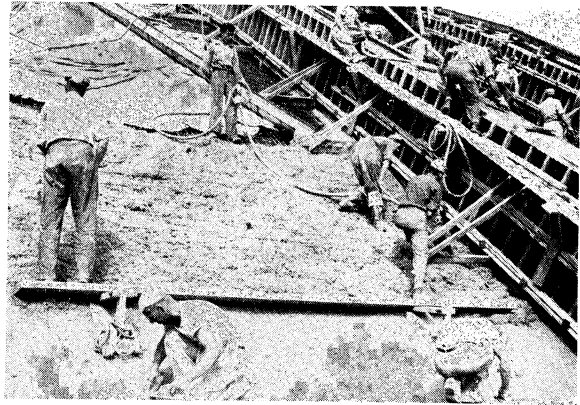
Winter operations at U. S. Air Force hangars of 160-ft span. Note the pipelines for pumping concrete and the extensive protective housing
